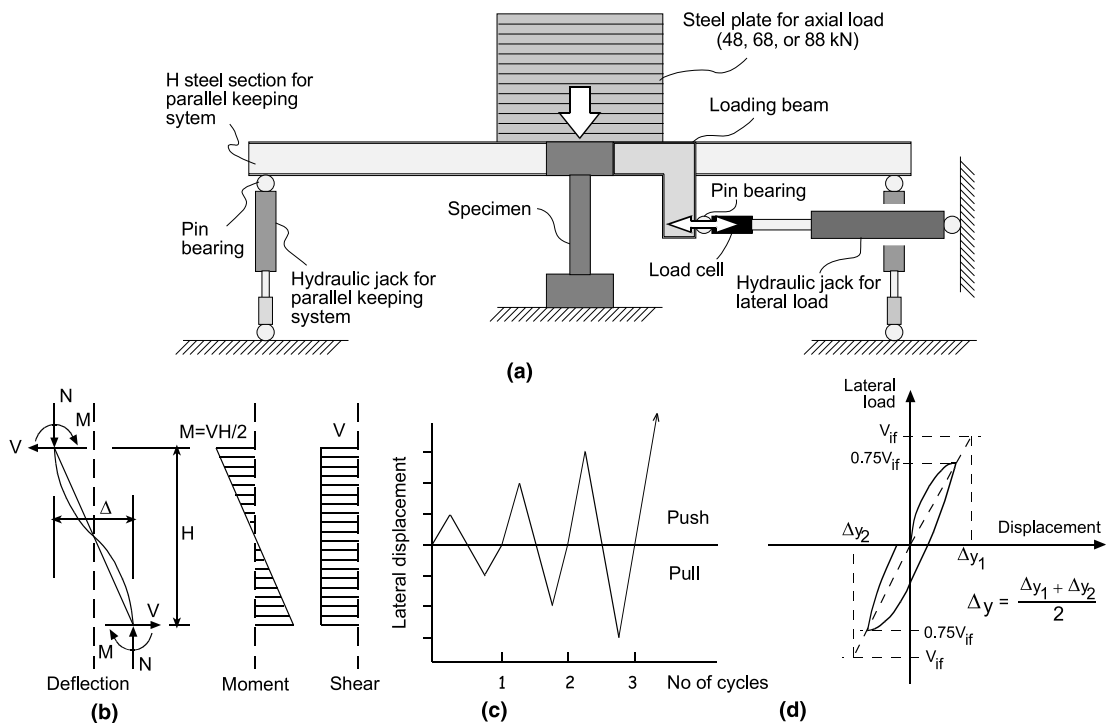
Test setup: (a) Loading system; (b) loading condition; (c) loading history and (d) definition of yield displacement.
